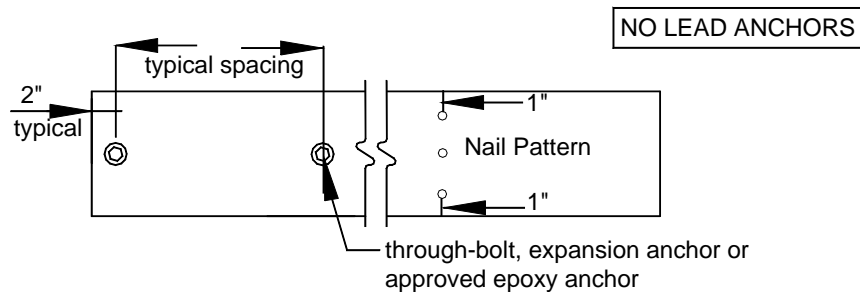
LEDGER BOARD FASTENER SPACING AND CLEARANCES
